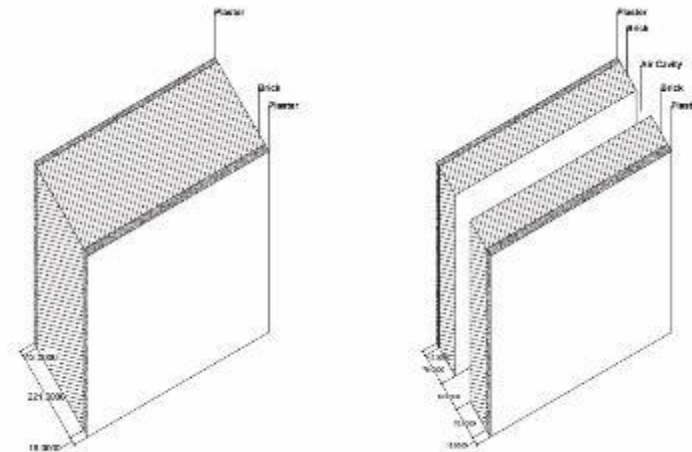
(Left) Case study designed wall (Right) Proposed Composite wall
